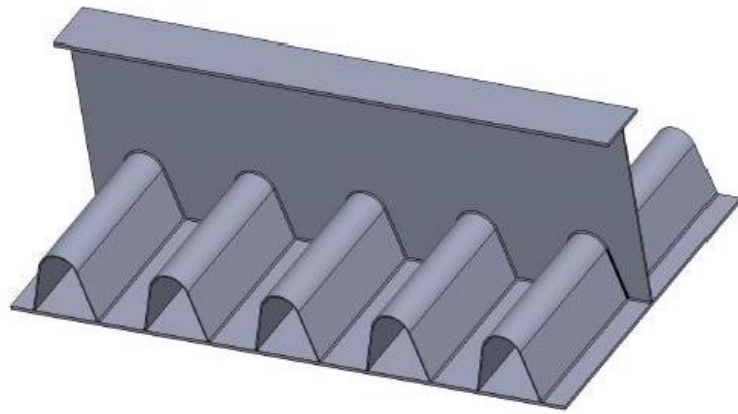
Illustration. Fitting of the floor beam to the assembled rib-deck panel in the inverted position.
